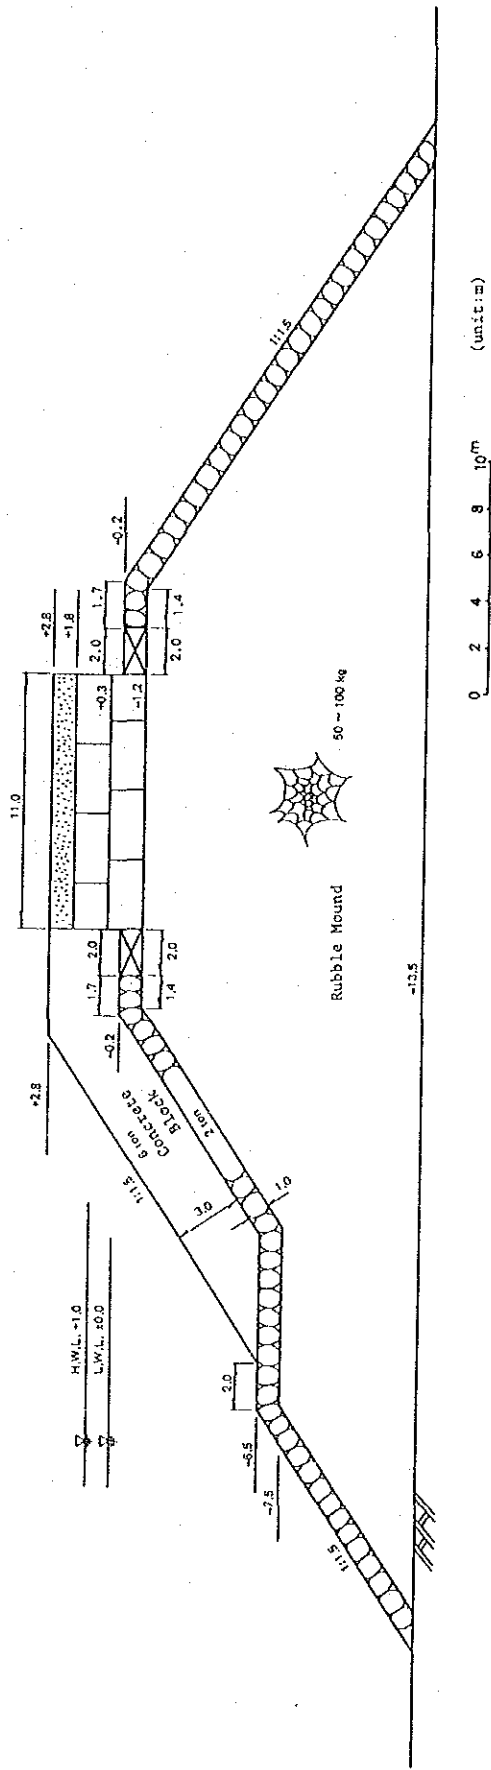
Cross Section of Breakwater (Alternative B)
